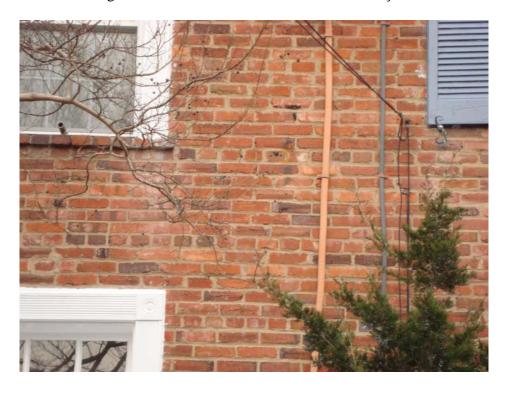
View of Existing Elevation's "Common Bond" Brickwork
